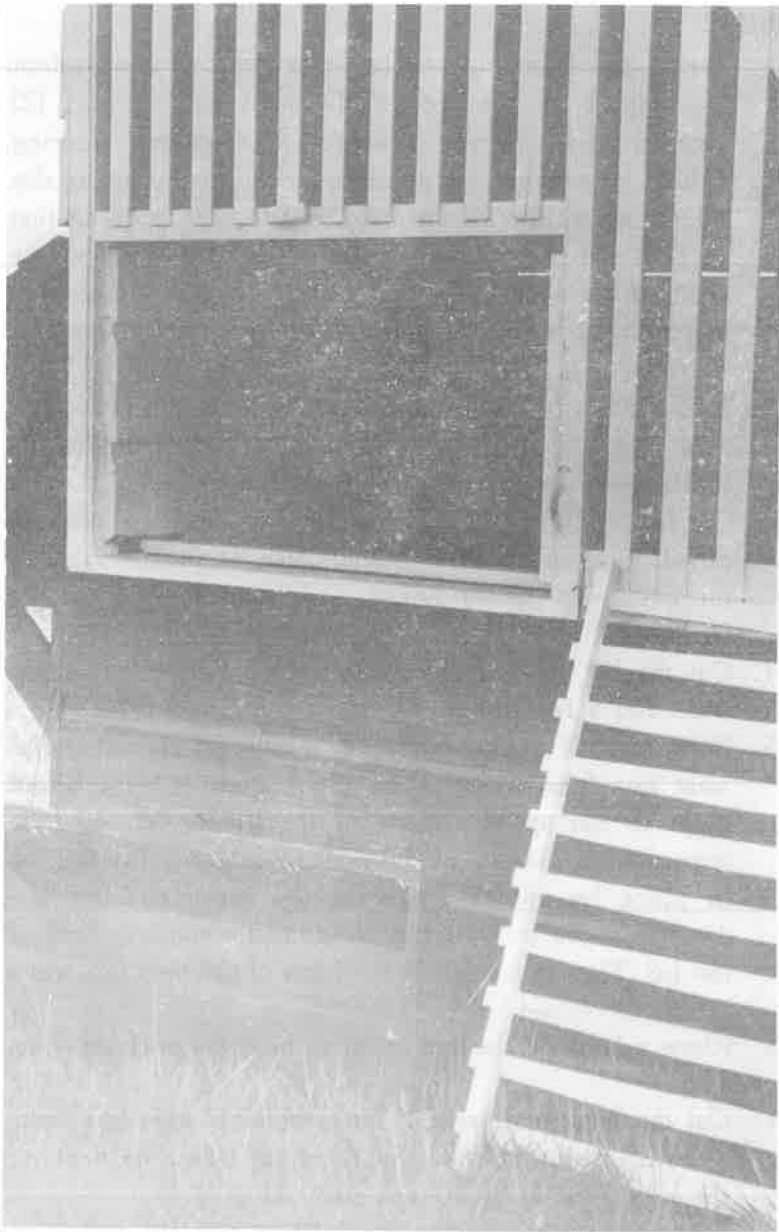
Front lathing and feed box opening. Feed boxes are supported by wires hooked to the facing laths.
